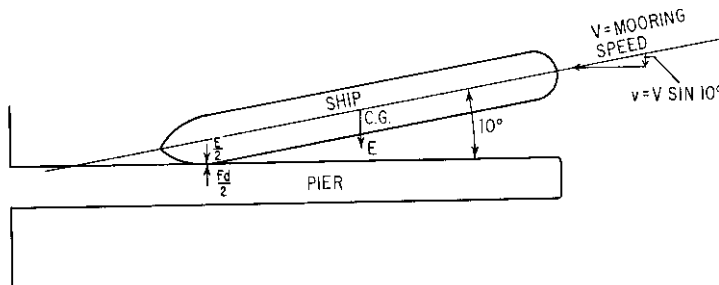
Ship is assumed to strike pier at 10° angle for design against impact.
